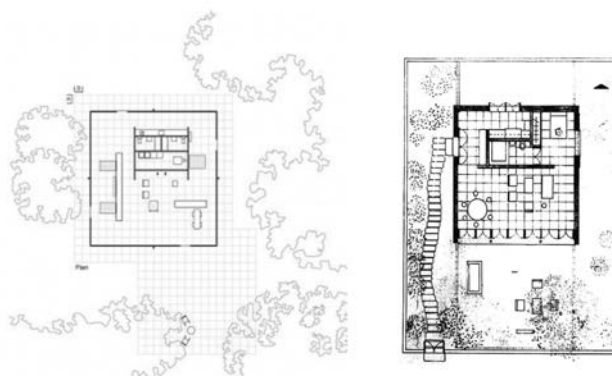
The plan of Coren House Project (Left) and Wang Da-Hung's own house (Right).
